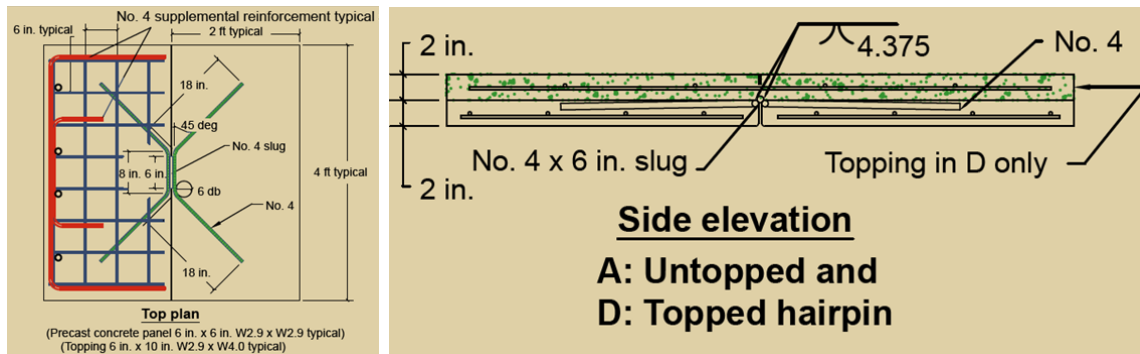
first type of connection tested by Naito and Cao (hairpin bars, metal slug and concrete topping)
